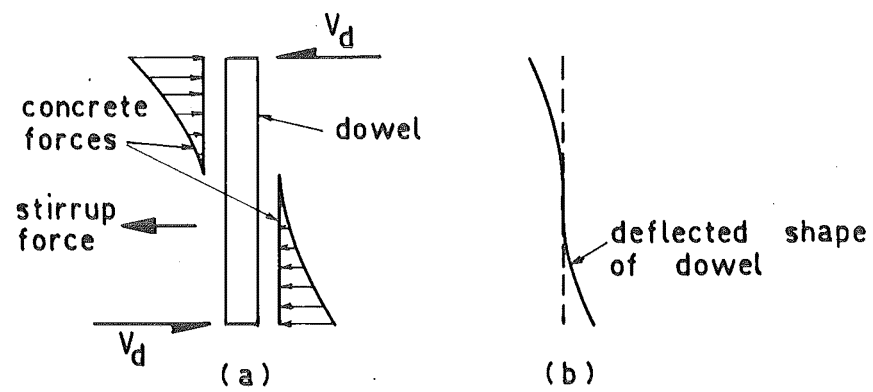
Loading on Dowel in Uncracked Specimen
